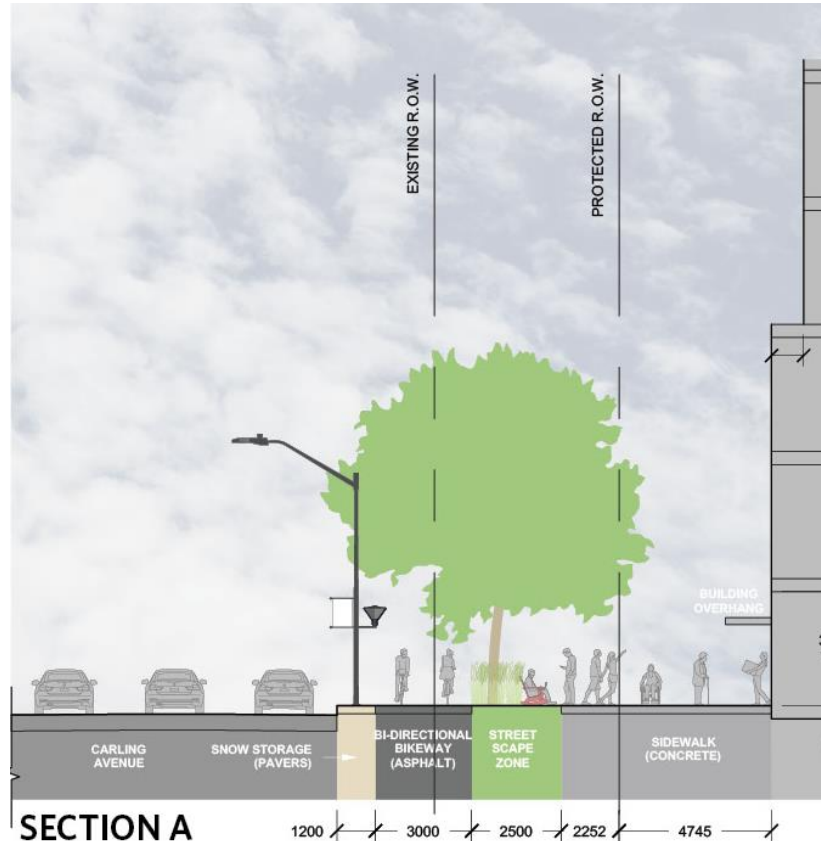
Master Site Plan - Public Realm Section at Tower 'A', Carling Avenue
